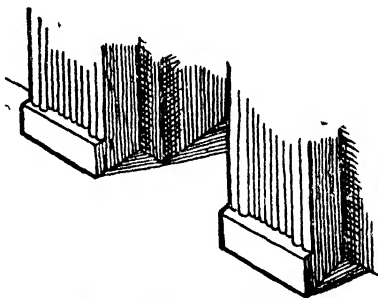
ALTERNATE ADVANCING AND RECEDING WALL WITH VERTICAL BANDING
